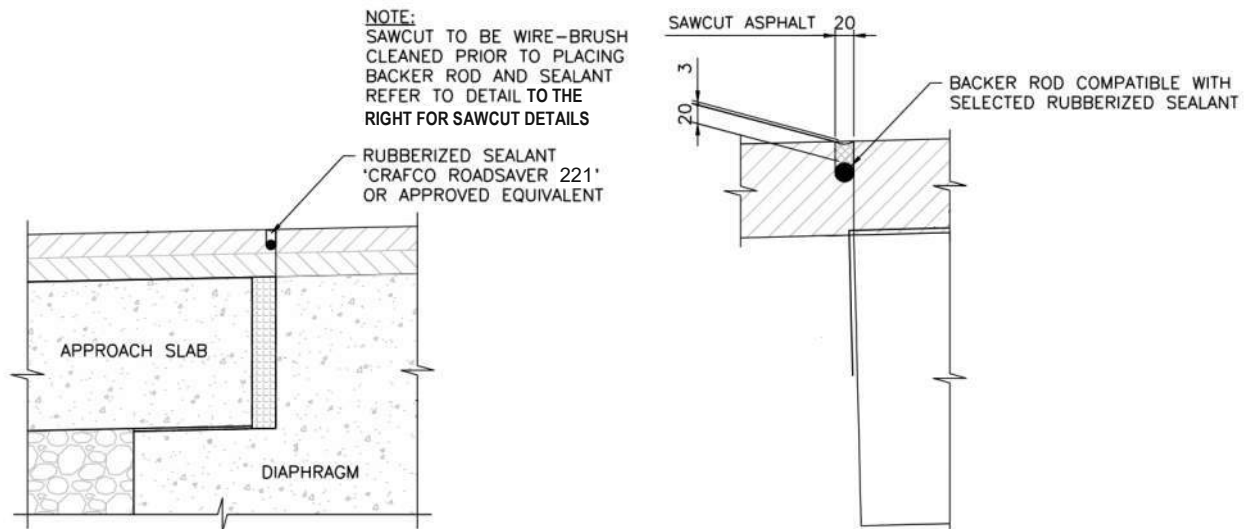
Proposed Alternative Strategy to Resealing Asphalt Deck Joints on Integral and Semi-Integral Bridges
